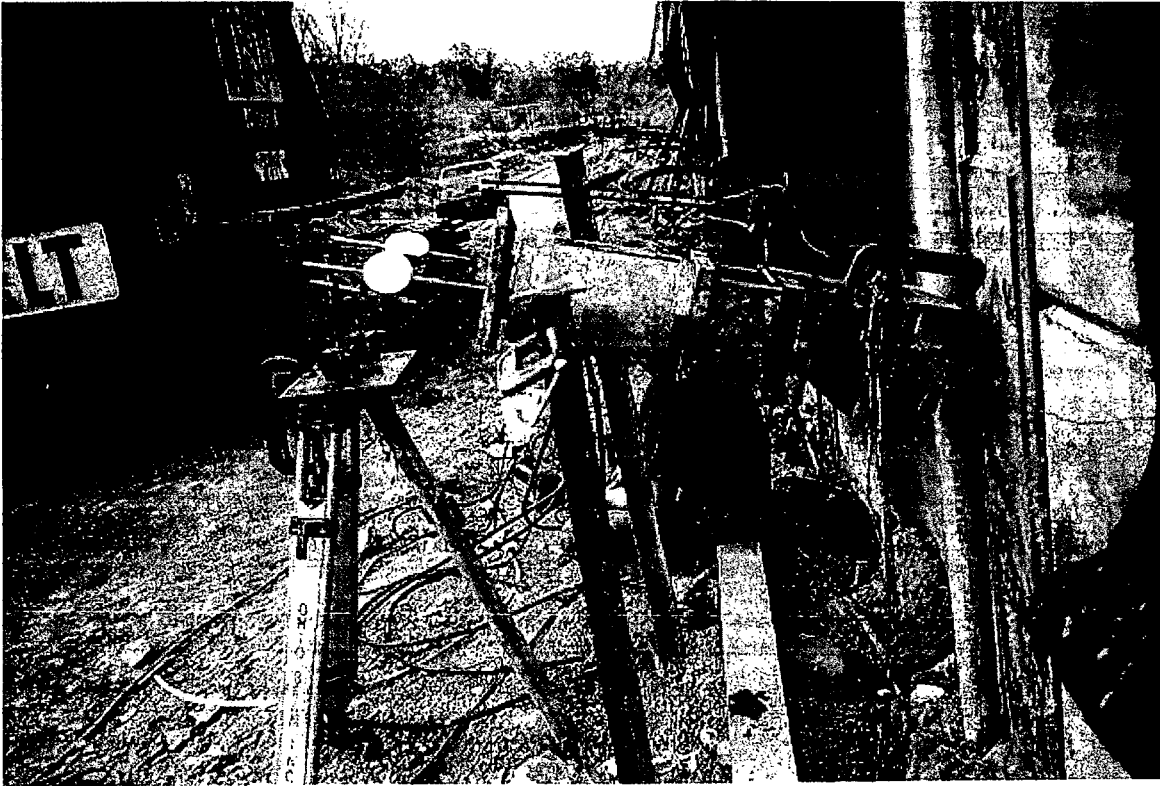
Testing of anchor #11-B in the lower tier wall.
